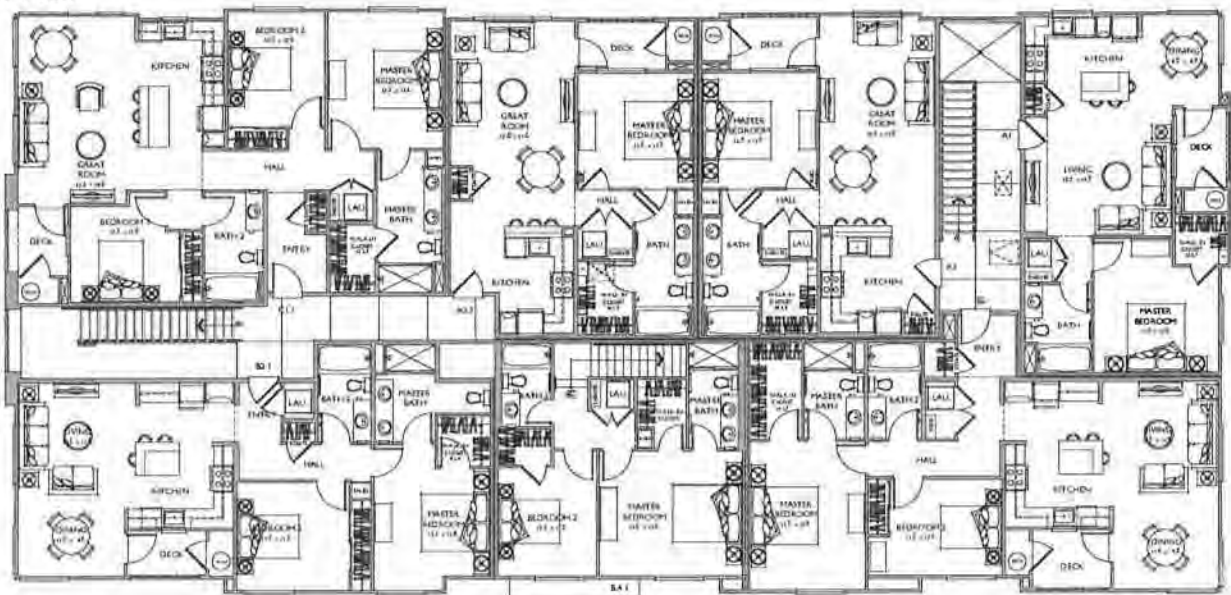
Conceptual Floor Plan – Second Floor – 13-Plex and 16-Plex
